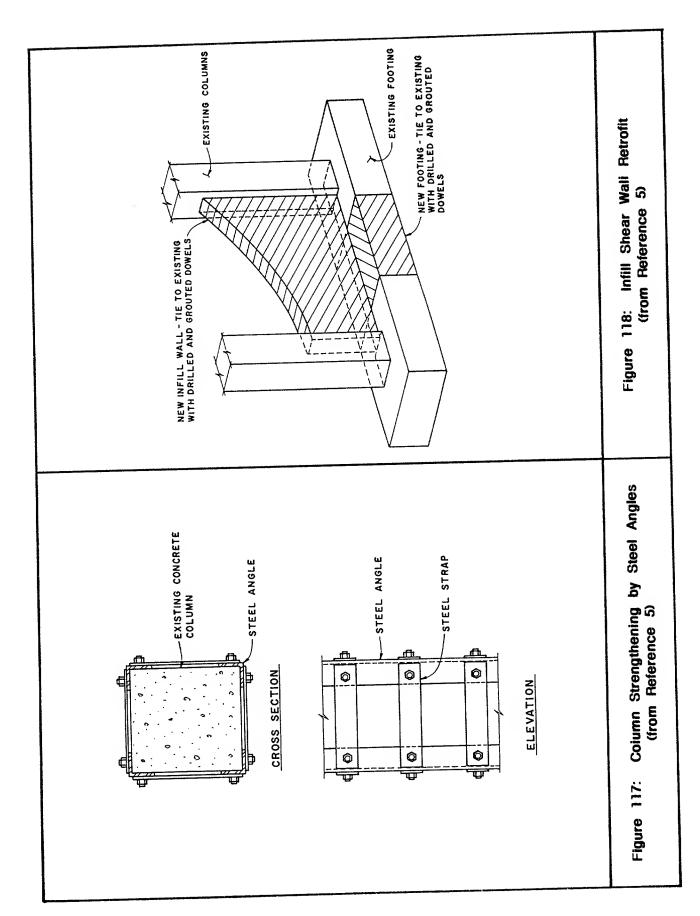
illustrates the use of a infill concrete shear wall to retrofit a multi-column bridge bent. This type of structural modification will have a significant effect on the structural strength and stiffness in the transverse direction and will require a new analysis to be made in order to obtain the revised design forces.
